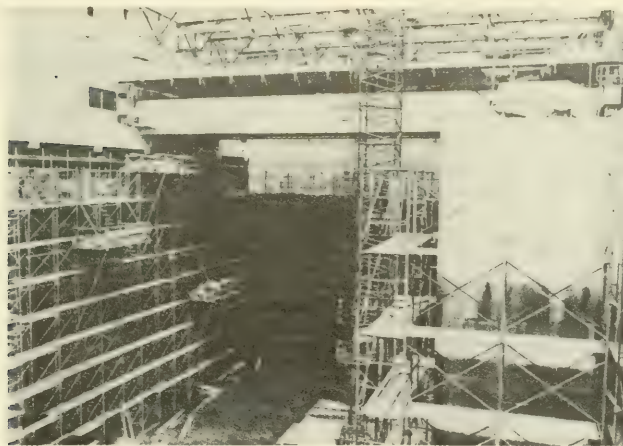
Inside view of the Fuji hall. Radiation shield wall (at right), walk ways (at left) and 70-ton bridge crane are seen. The beam collision point is at the center of photograph (5.7 m above the floor). (April 1984)
